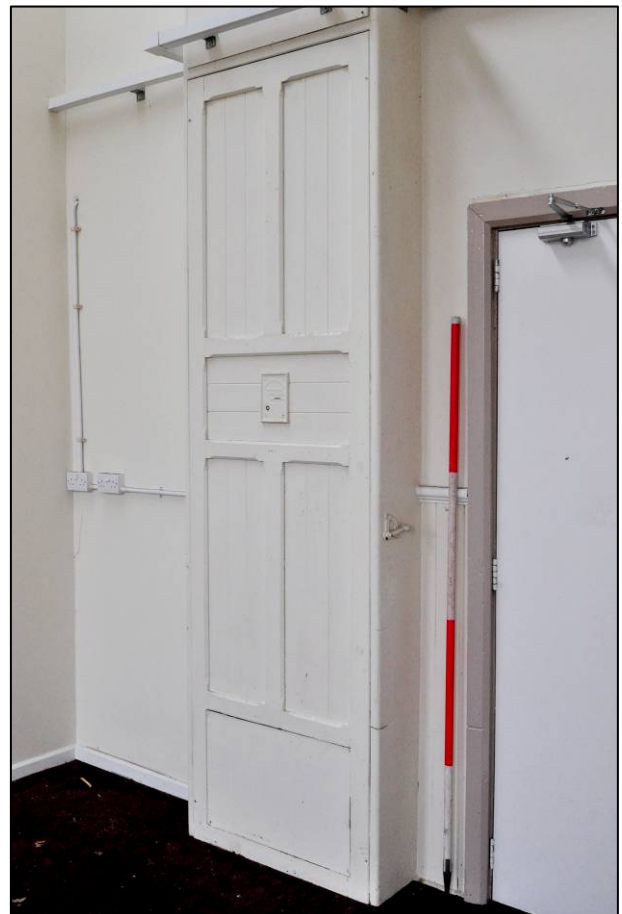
1895 Higher Grade Boys' School, classroom (2F8), northern ventilation duct to east wall, looking E (photo 2342).
